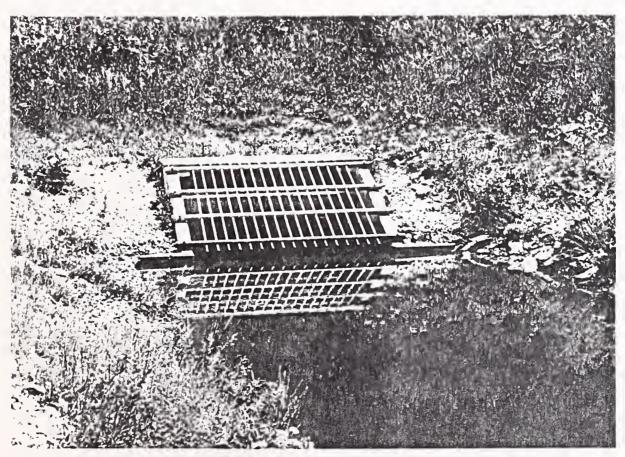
Outlet structure. Standing on right bank looking upstream at outlet structure/energy dissipator.
